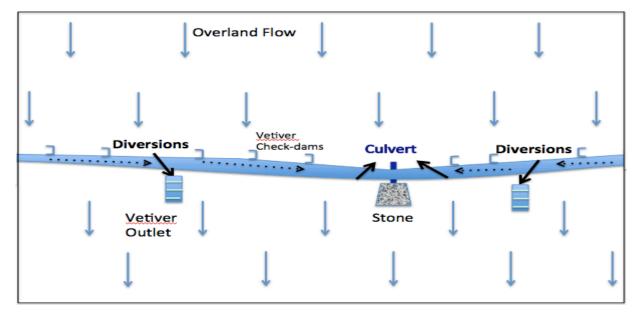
Road running across a slope with a natural drainage – In this case – diversions are used as well as a culvert with a rip rap outlet pad to reduce erosion (Note- two diversions are used at the bottom of the hill in order to contain runoff which could create headcutting into the road section)
